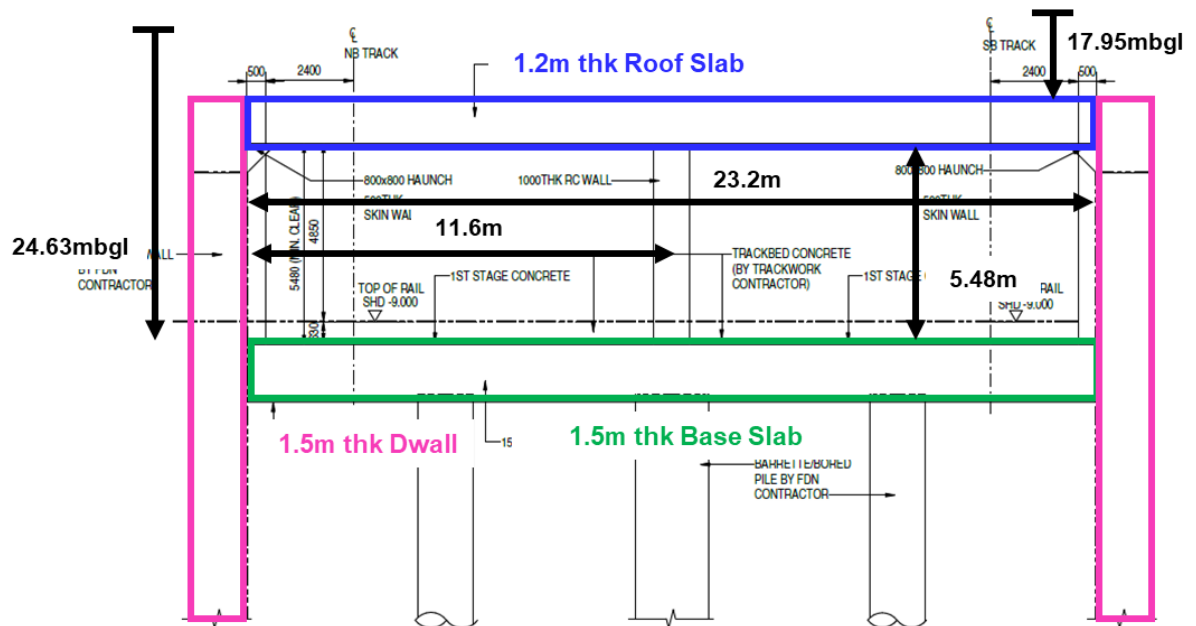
Typical cross section of C717 Cut-and-Cover Overrun Tunnel
